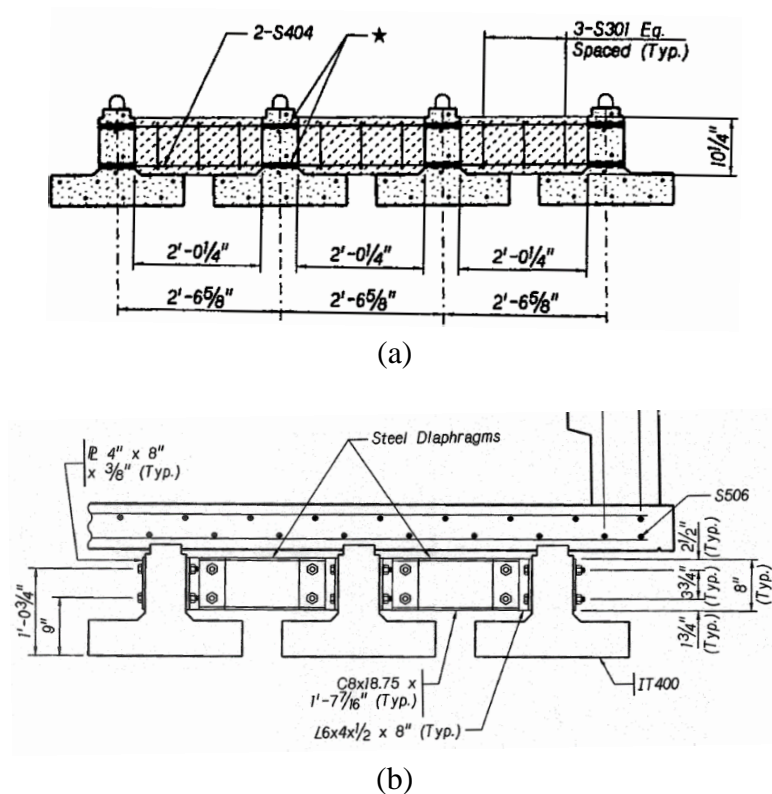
Drawings of an example intermediate diaphragm layout for an IT girder bridge: (a) concrete and (b) steel (courtesy of NDOT).
